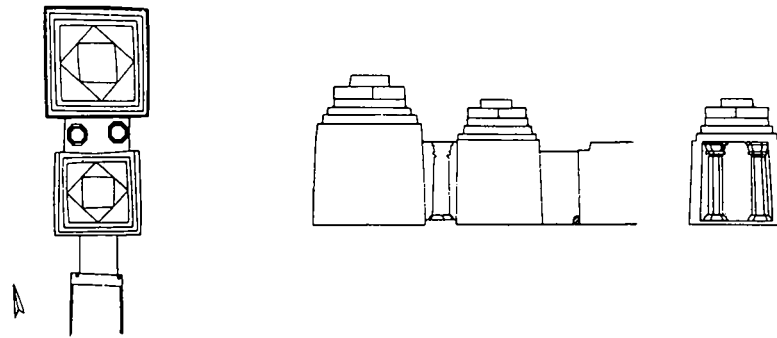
Ceiling plan and two sections of Ssang-yŏng-chong 雙楹塚 쌍영총
